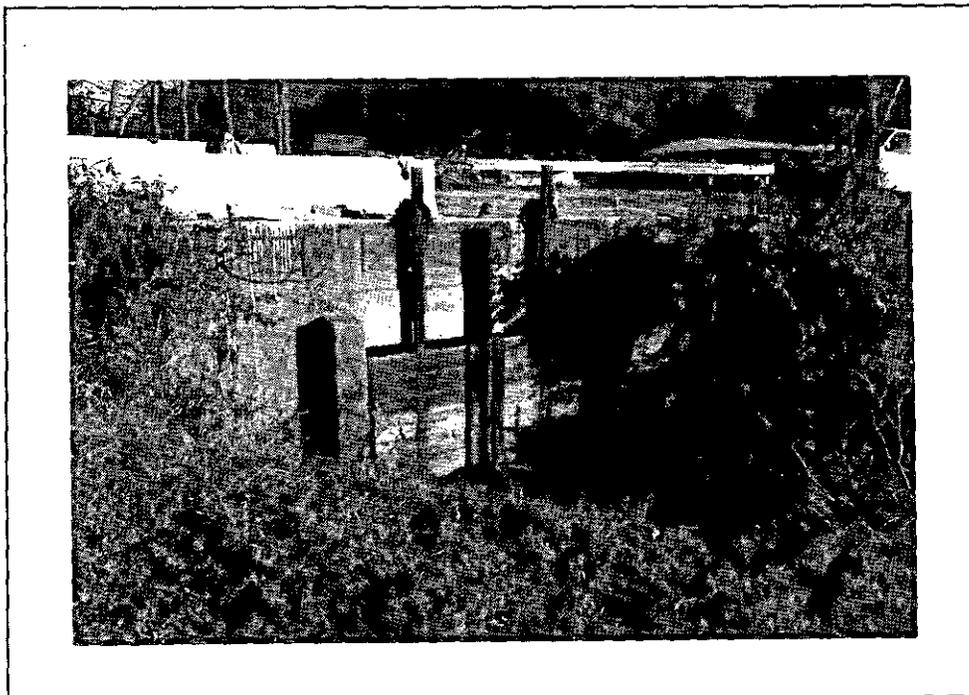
State Highway Bridge 407A (N-12645), Looking Southeast
